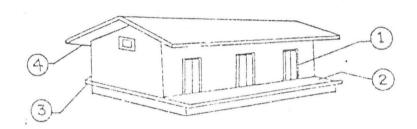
Modern warehouse. (I. sealed door 2. floor 3. Rodent proof slab 4. Air proof roof
